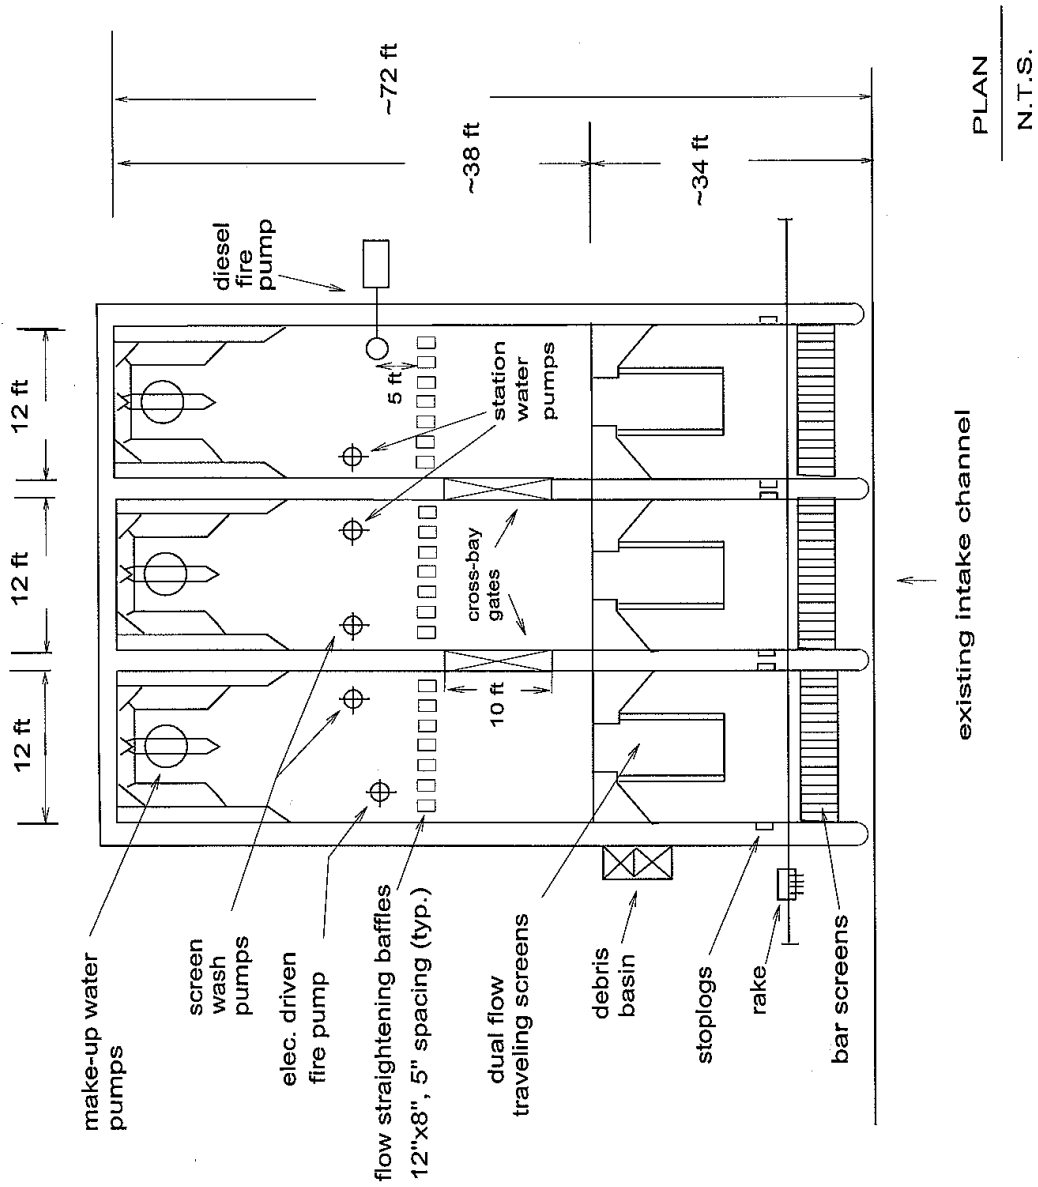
Plan View of NAPS Unit 3 Makeup Water Pump (Dominion 2008)
